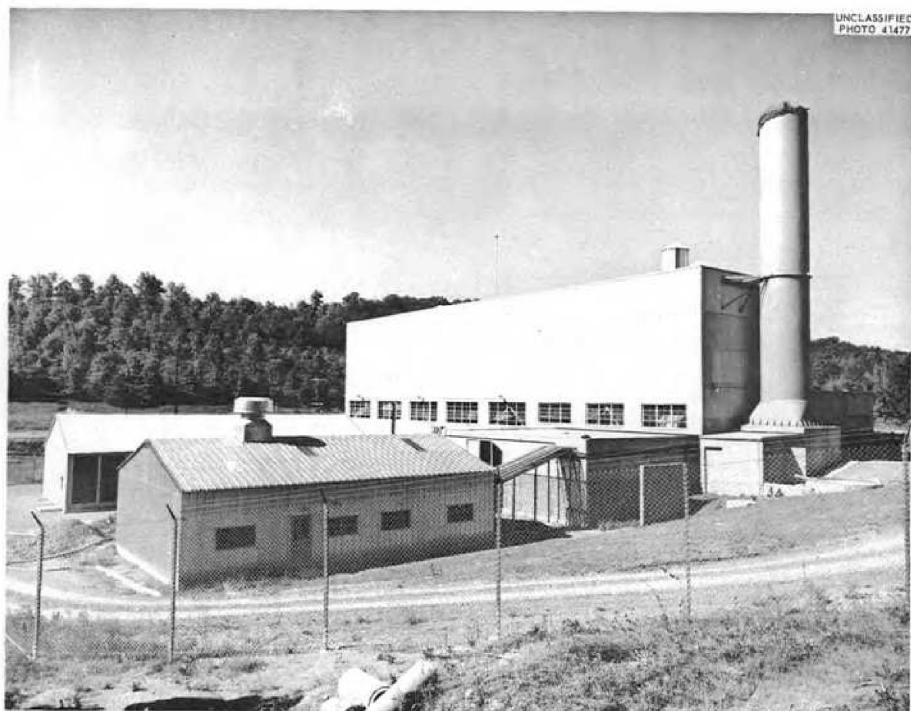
Status of Facility as of August 1957. View looking toward southwest corner of building.
